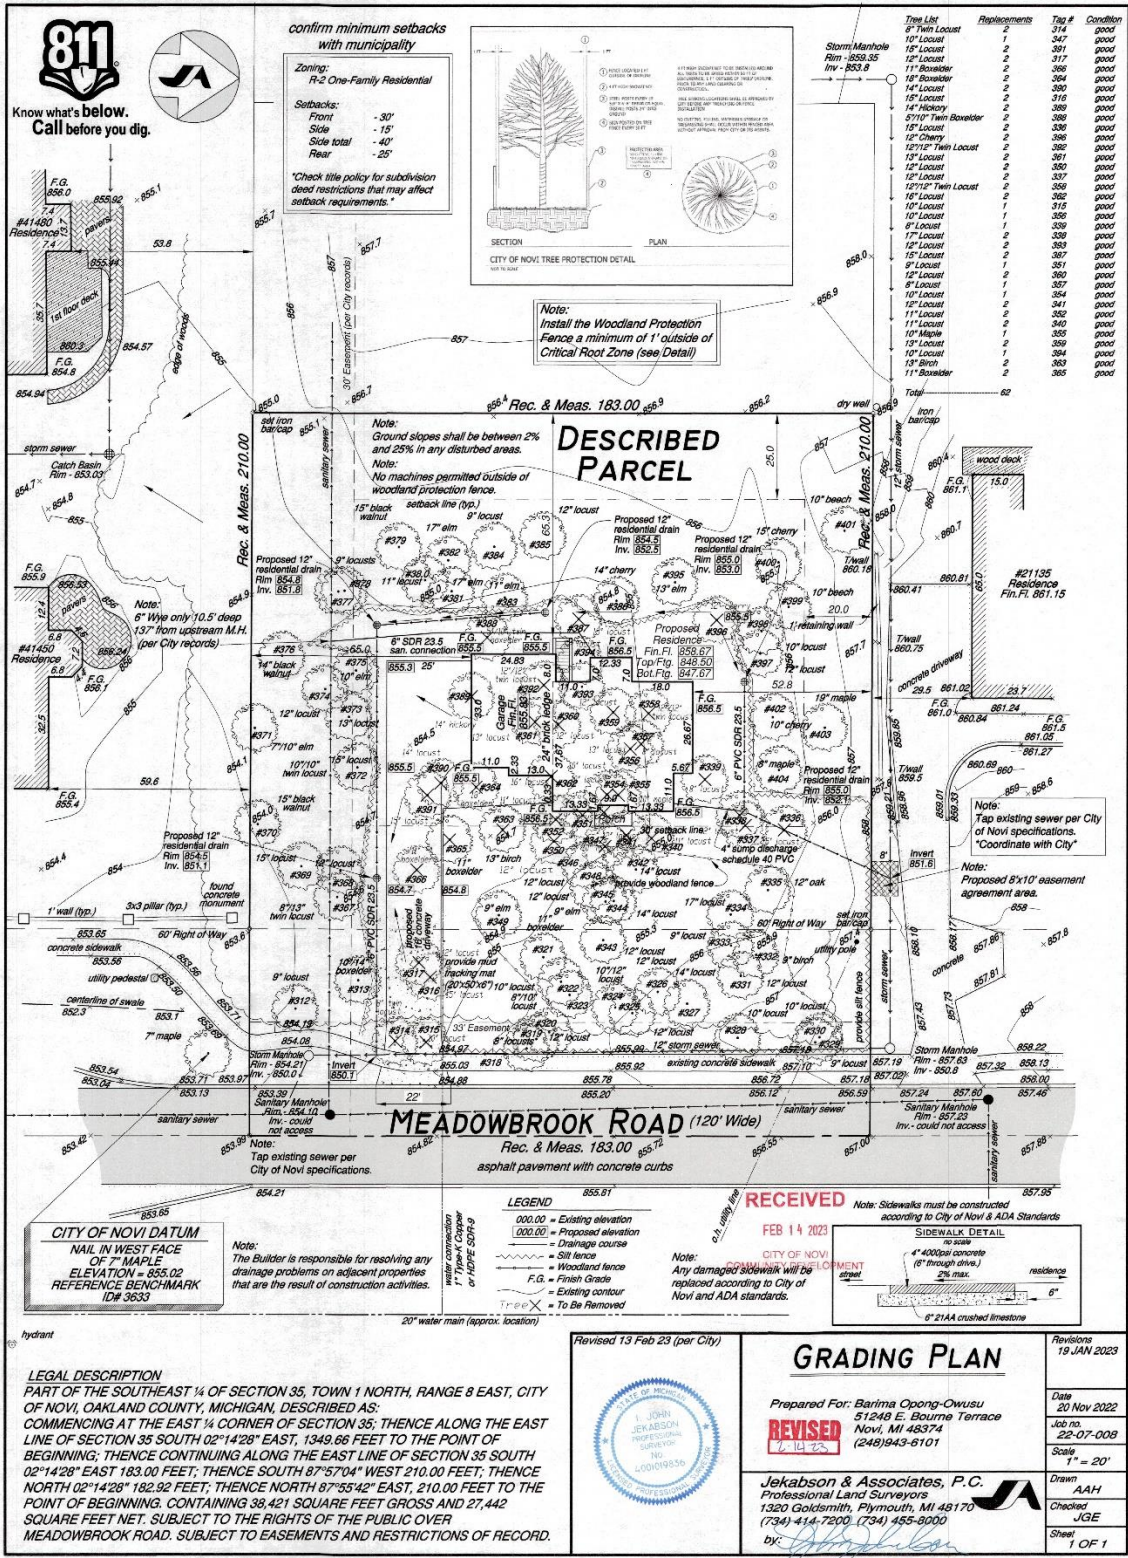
2111 Meadowbrook Road Revised Plot Plan
